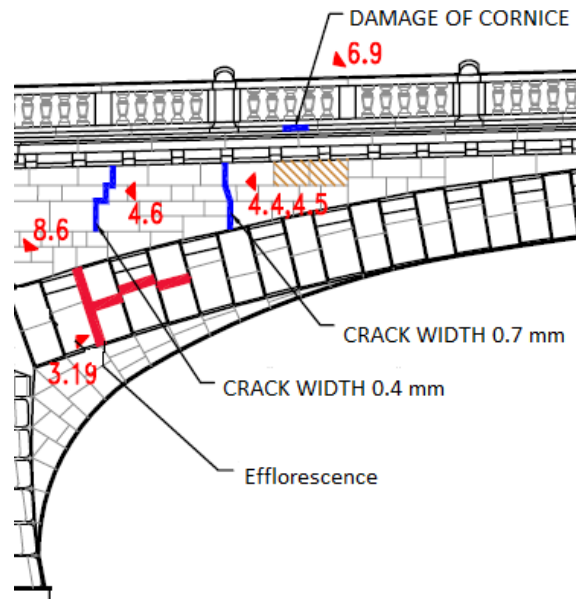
Mapping of visible damage in the spandrel wall near pier No. 2.
